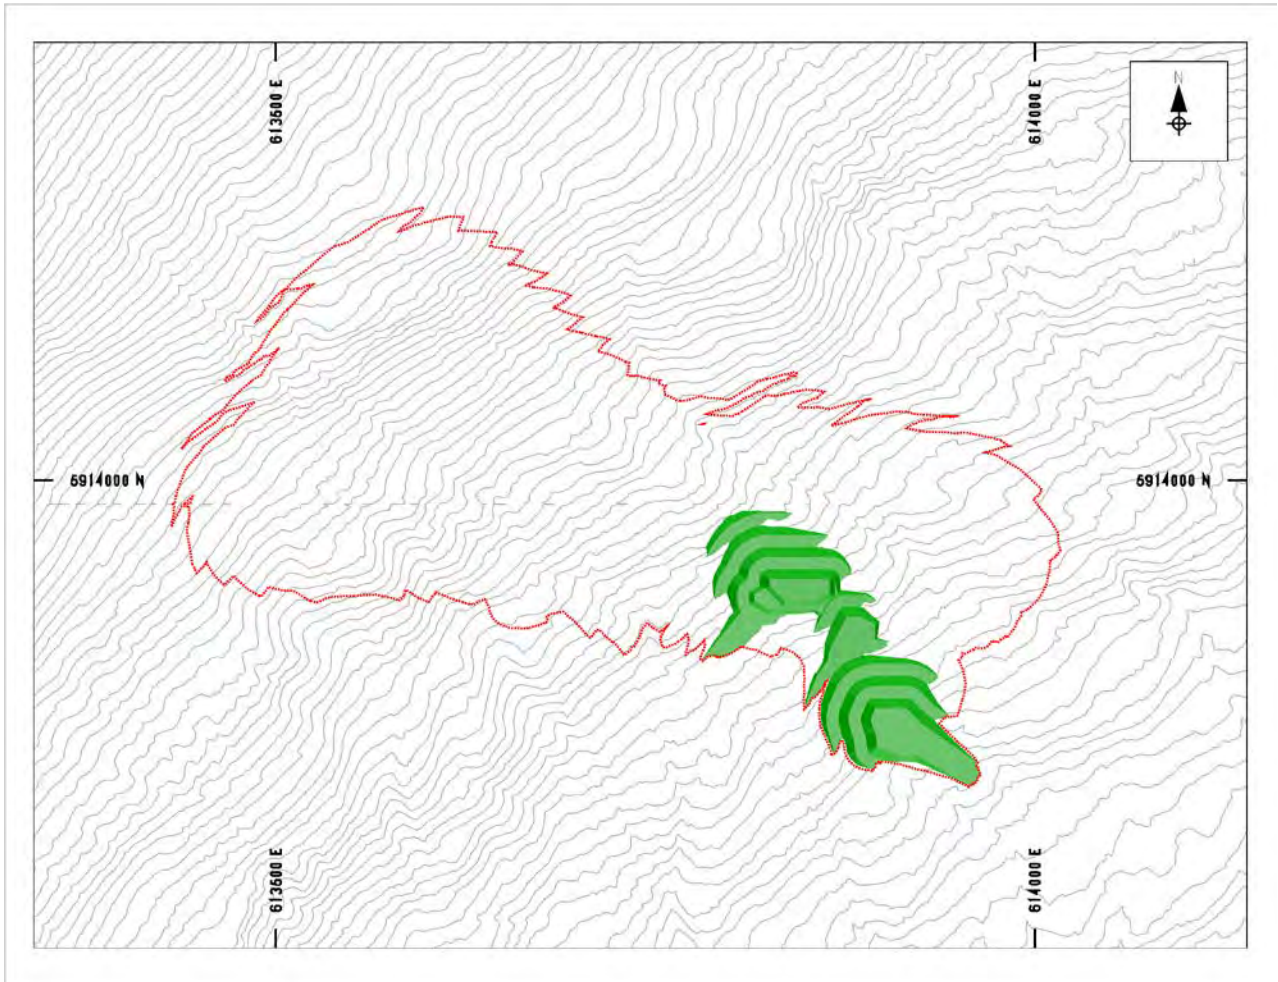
Plan View of Starter Pit D652 with the Pit Limit Outline
